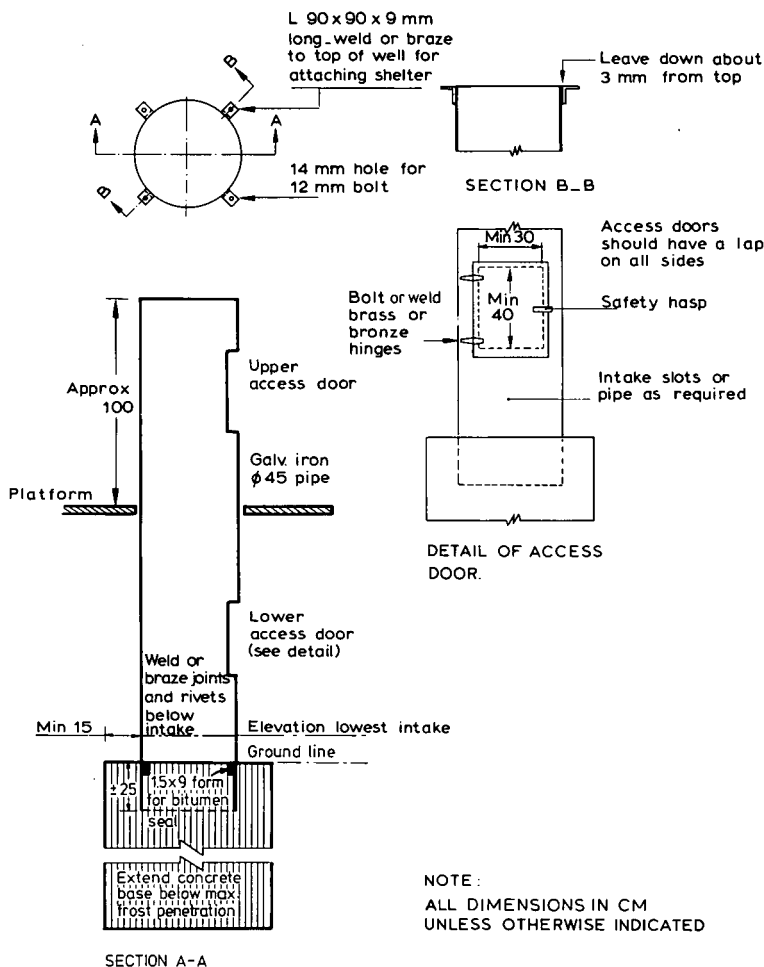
Example of a steel stilling well for low head installations (after U.S. Dept. of Agriculture)
